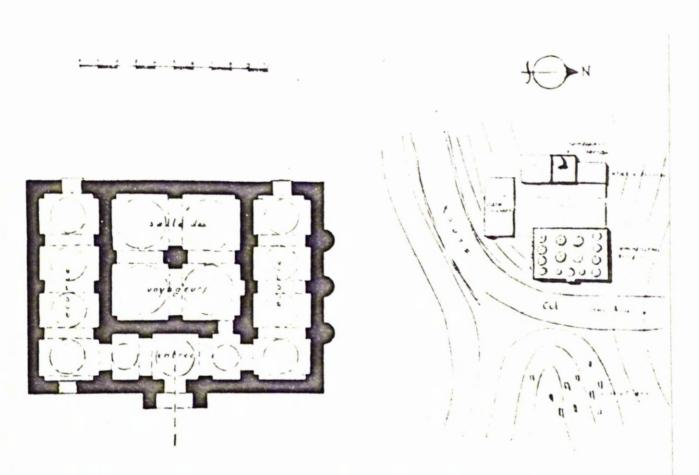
Plan of Caravansarai Imam Zadeh Hashem
